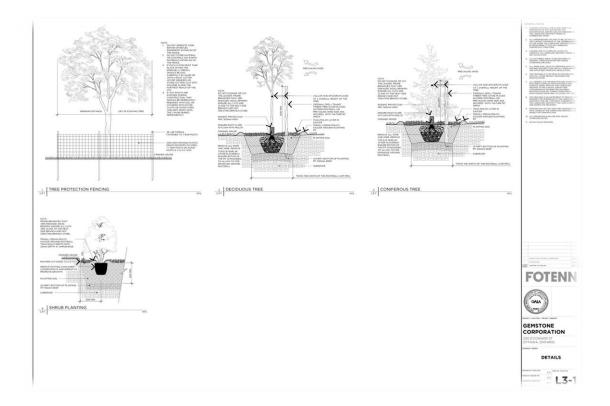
Landscape planting plan with details. Credit: Fotenn Consultants
